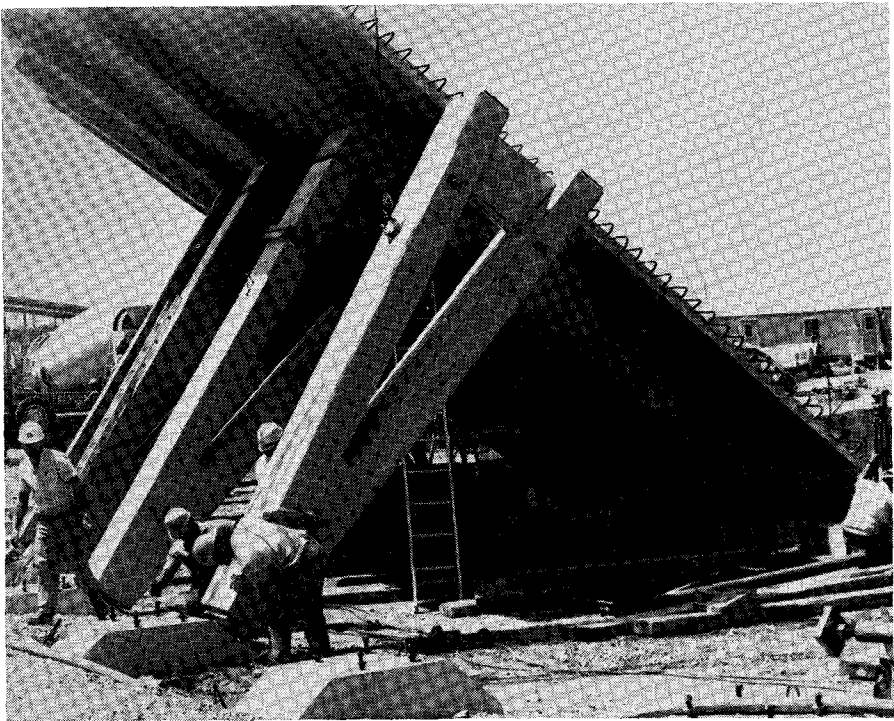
Slanted precast V-columns being connected to anchorage block.
